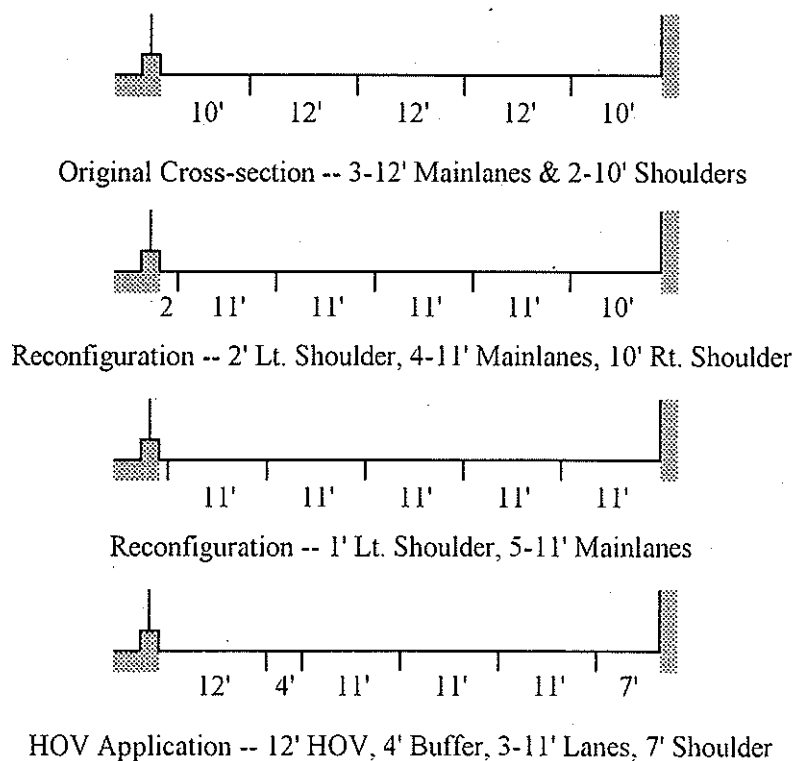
Alternate Cross-Section Configurations When Converting Shoulders to Travel Lanes.
